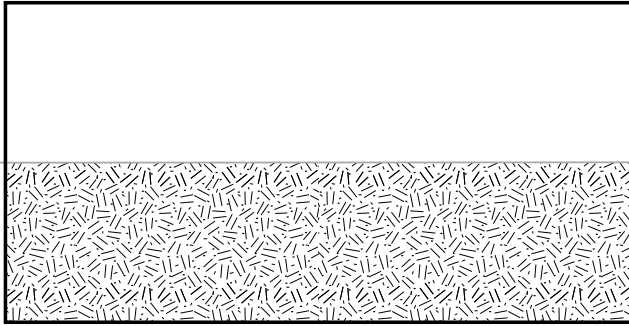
Spread adhesive over ½ of the floor up to the chalk line
